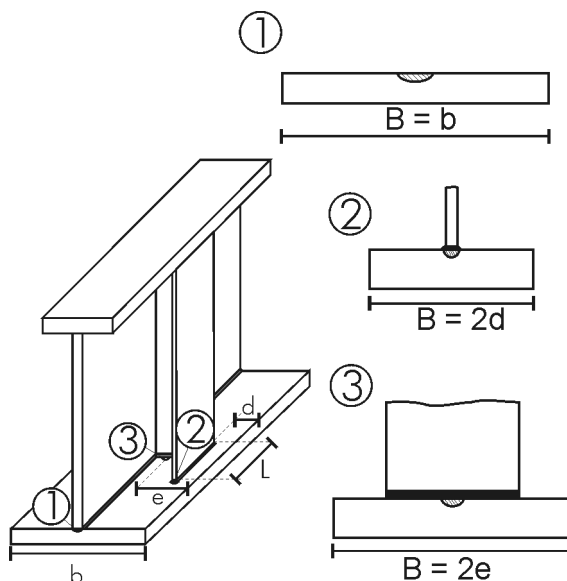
Steel beam with fracture mechanics models ①, ②, ③ representing fatigue details
